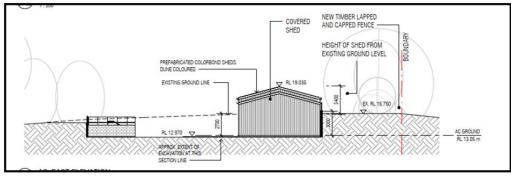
Building Height above Existing Ground (Source: Proposal Plans by C2 Architecture)
